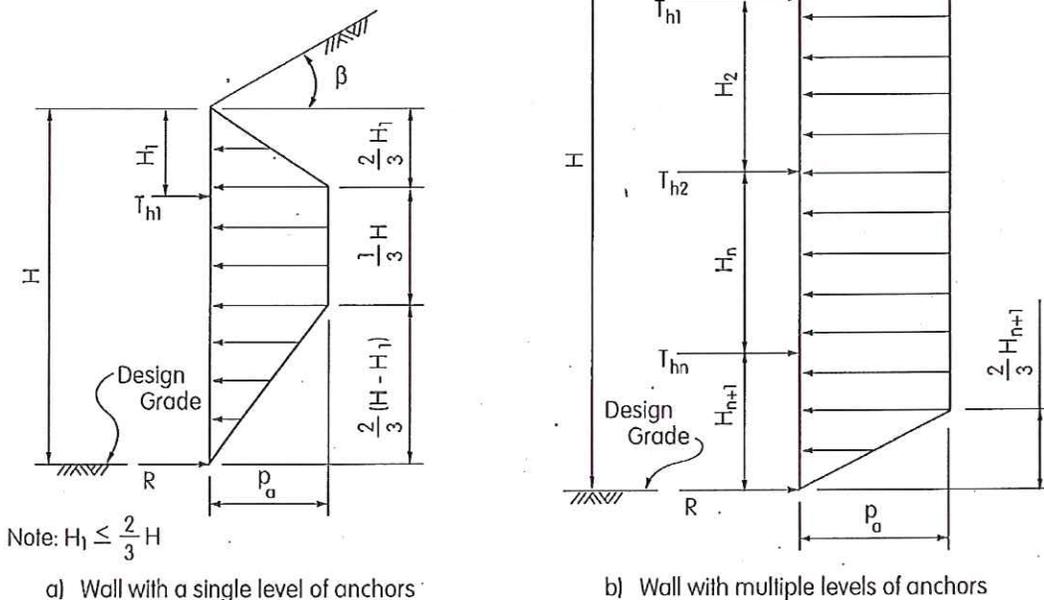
Lateral Earth Pressure Distributions for Anchored Walls Constructed from the Top Down in Cohesionless Soils
